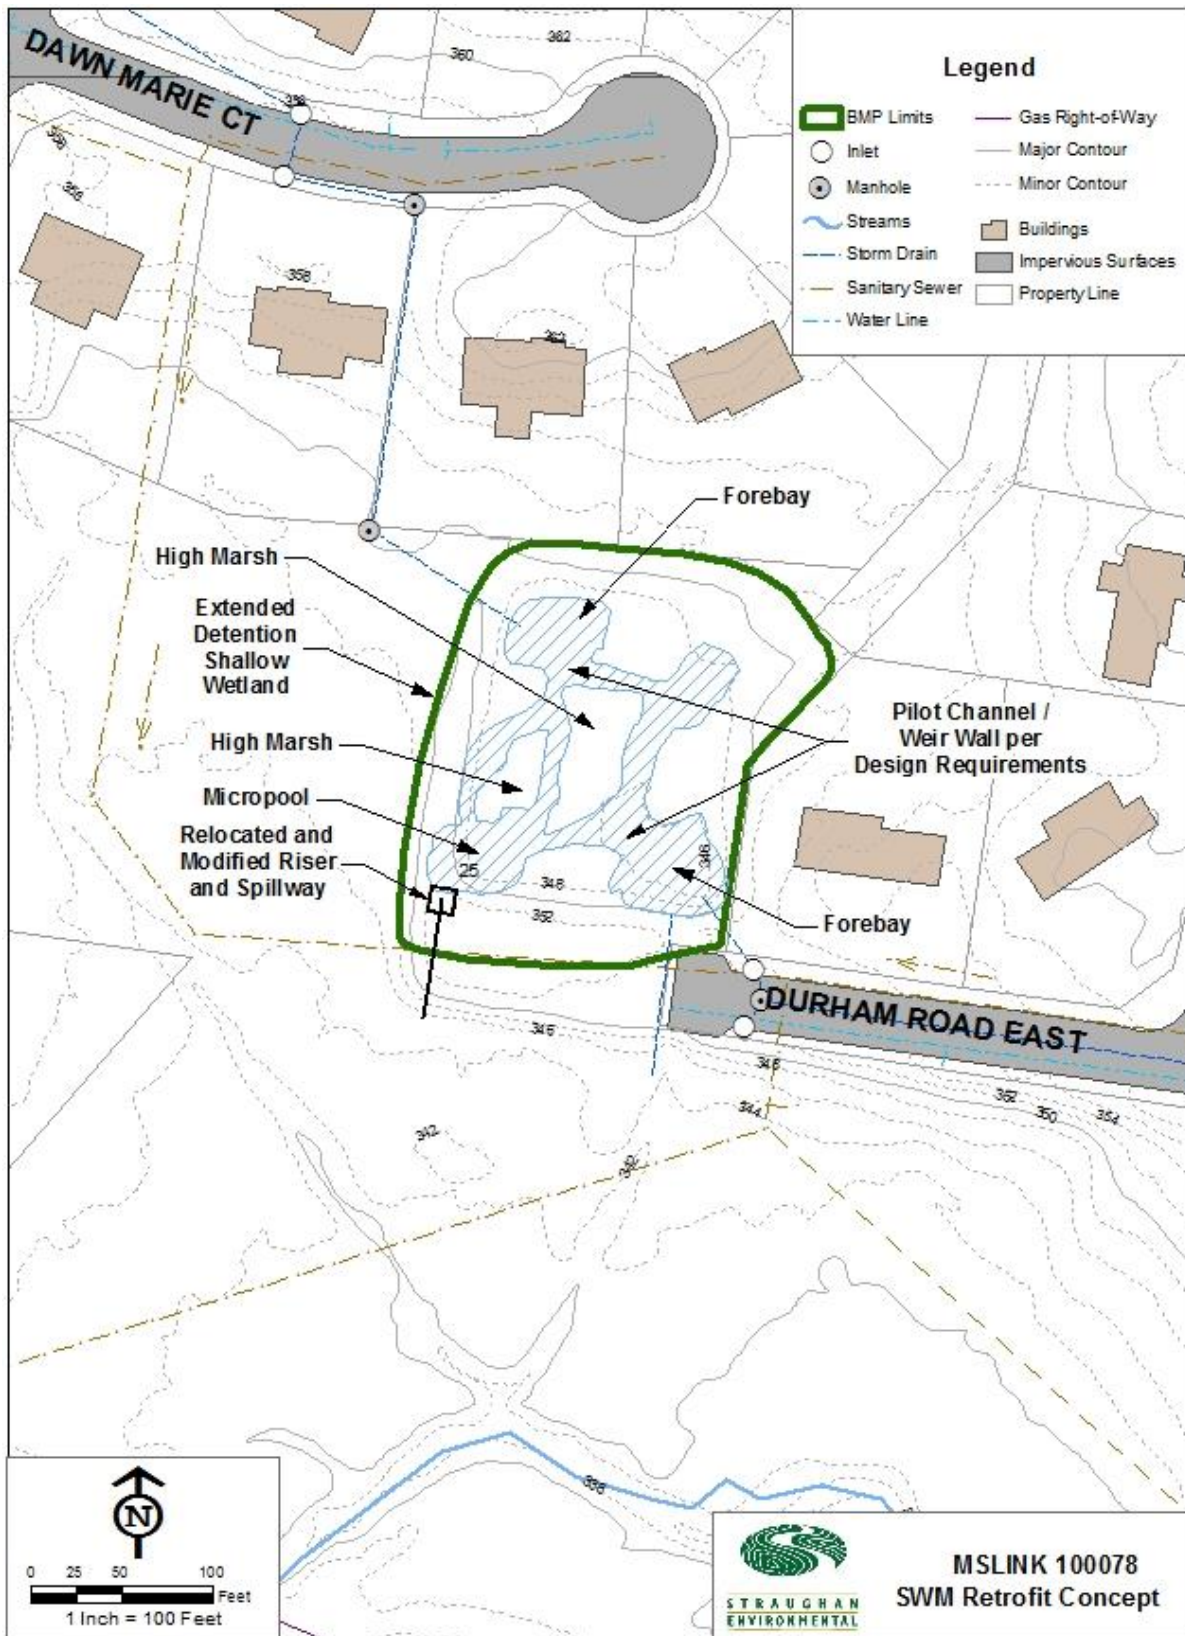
Concept Design Plan View at dead end of Durham Road East, SLP-BC-D774
